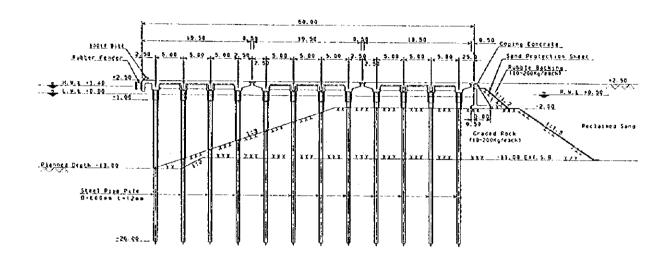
(1) Typical Cross Section of Quaywall W2 (Open Pier with Retaining Wall)
